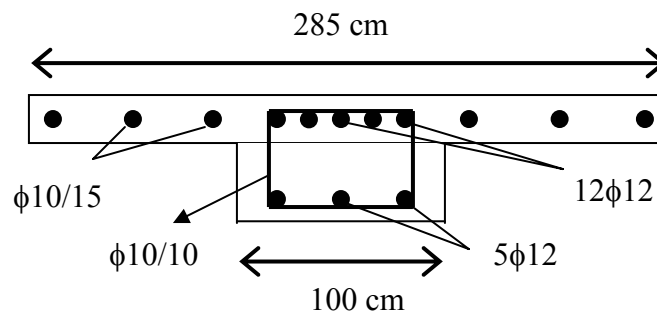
Typical Slab-Beam Section of the Flat-Slab Building
